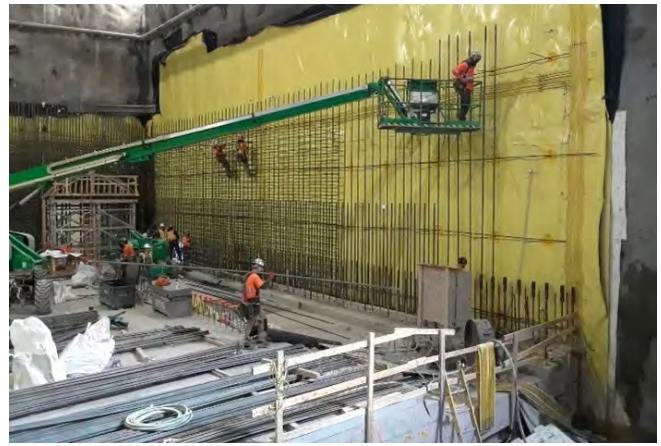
Waterproofing sheet membrane in-place for 1.3 m thick perimeter walls in station box. Rebar fastened to BA anchors spaced at 1.8 m (6 ft) (blue arrows).
